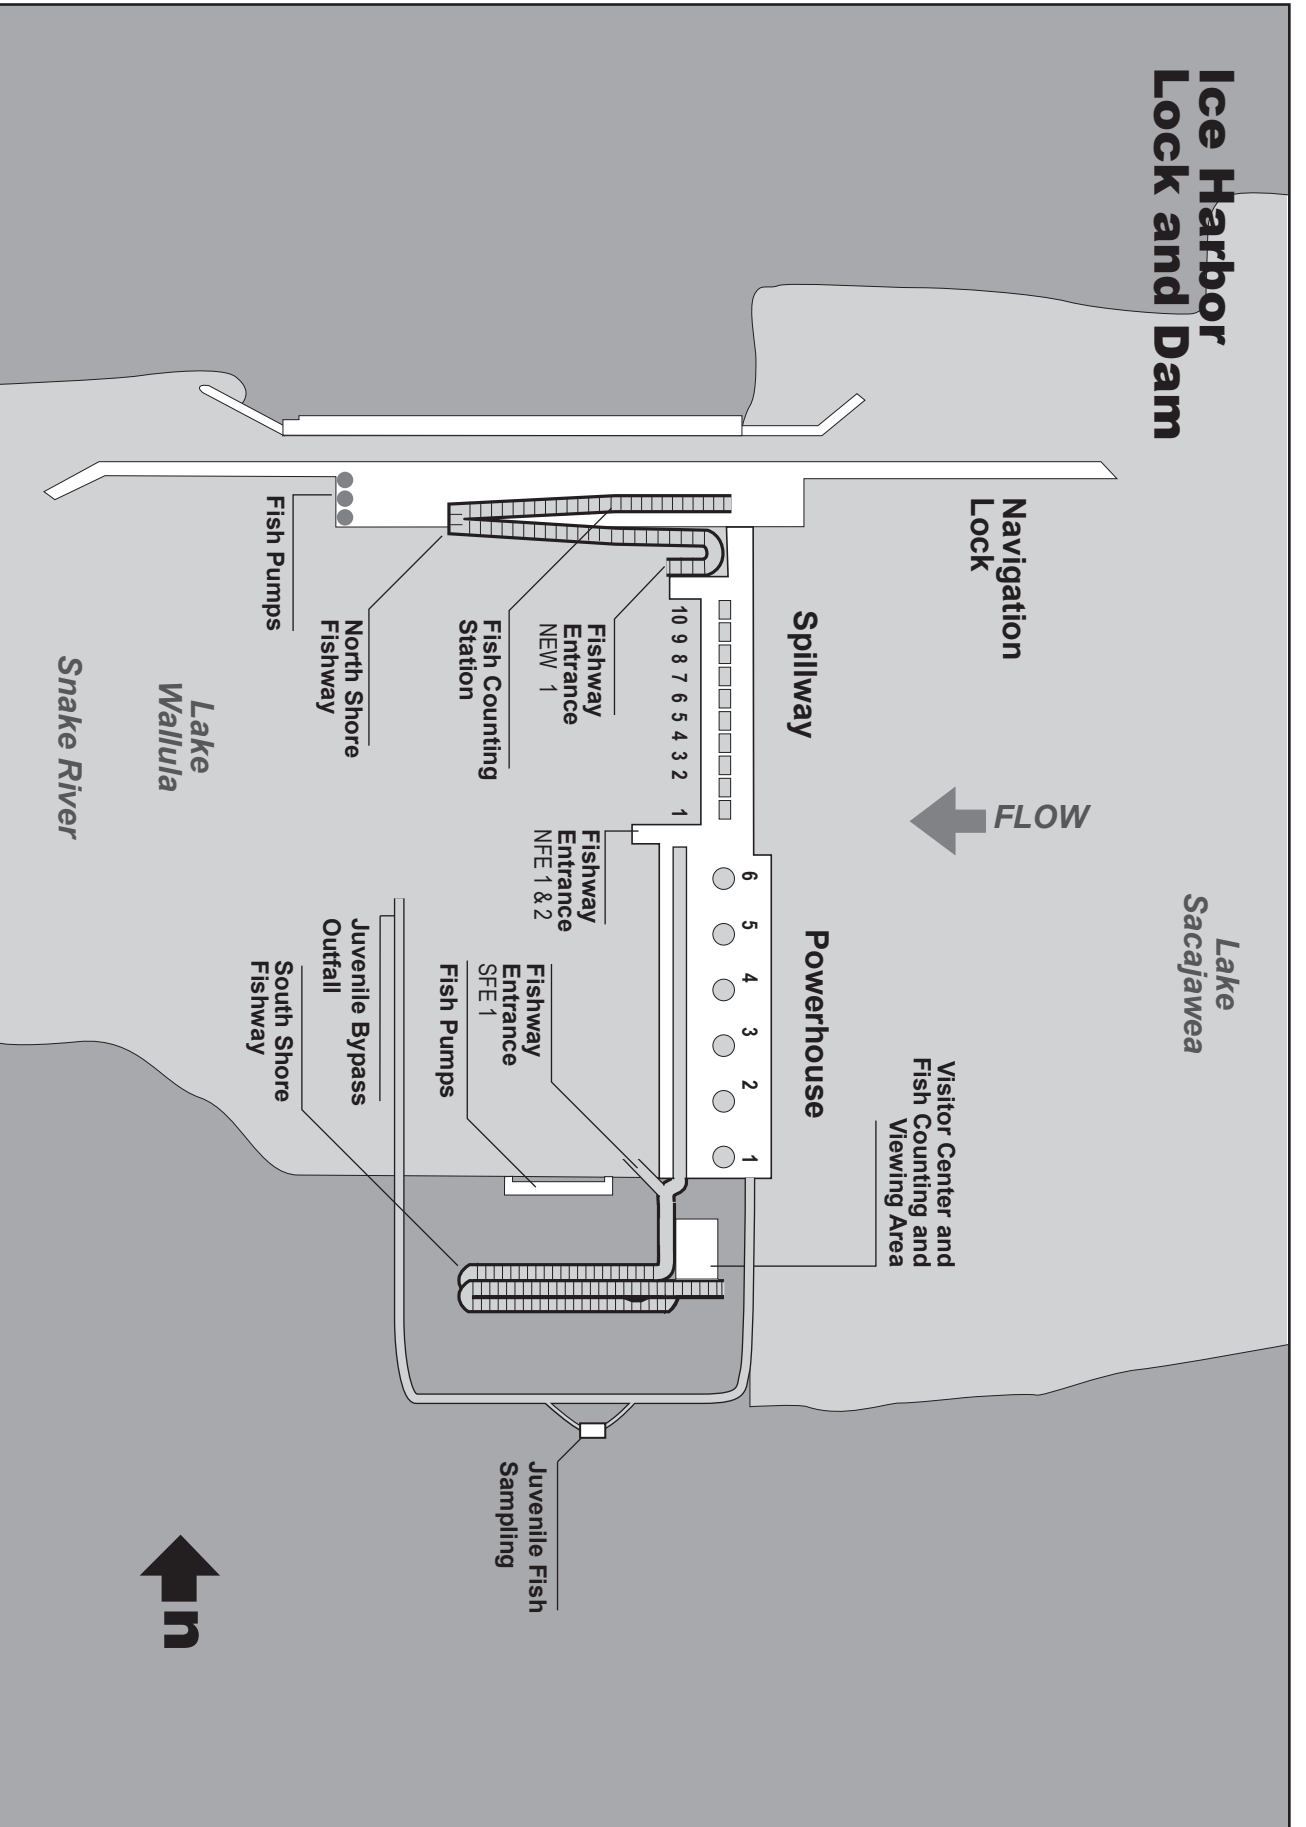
Ice Harbor Lock and Dam General Site Plan
